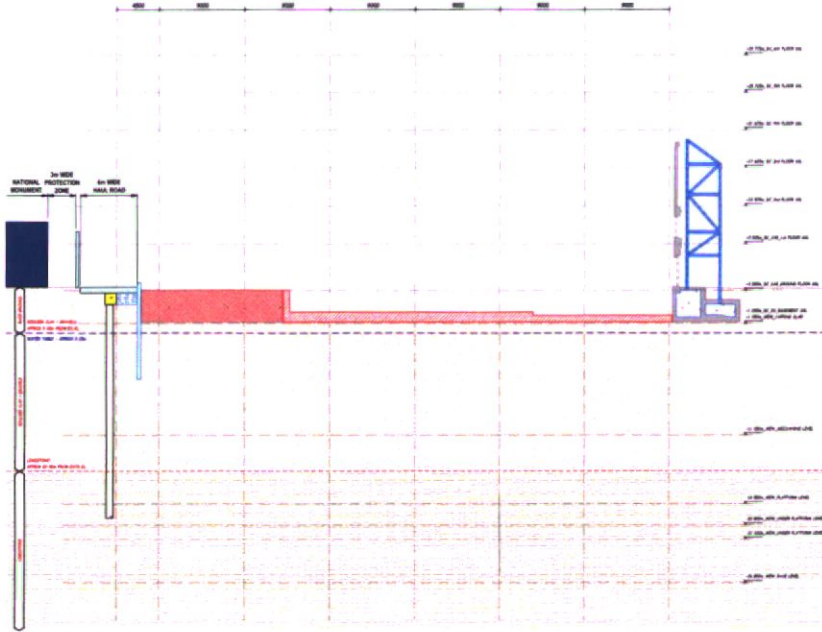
Phase 2 - Continue piling matt and grub up and remove old basement and foundations.
